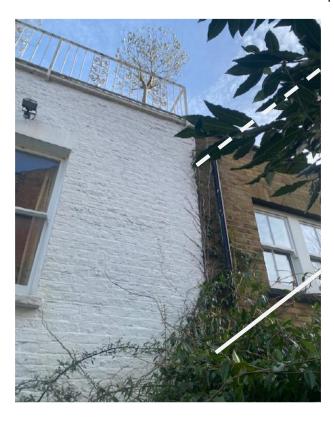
The existing roof terrace at the second floor level, on top of 11 Willoughby Road's existing extension would overlook the proposed roof terrace, creating an overlooking problem.
